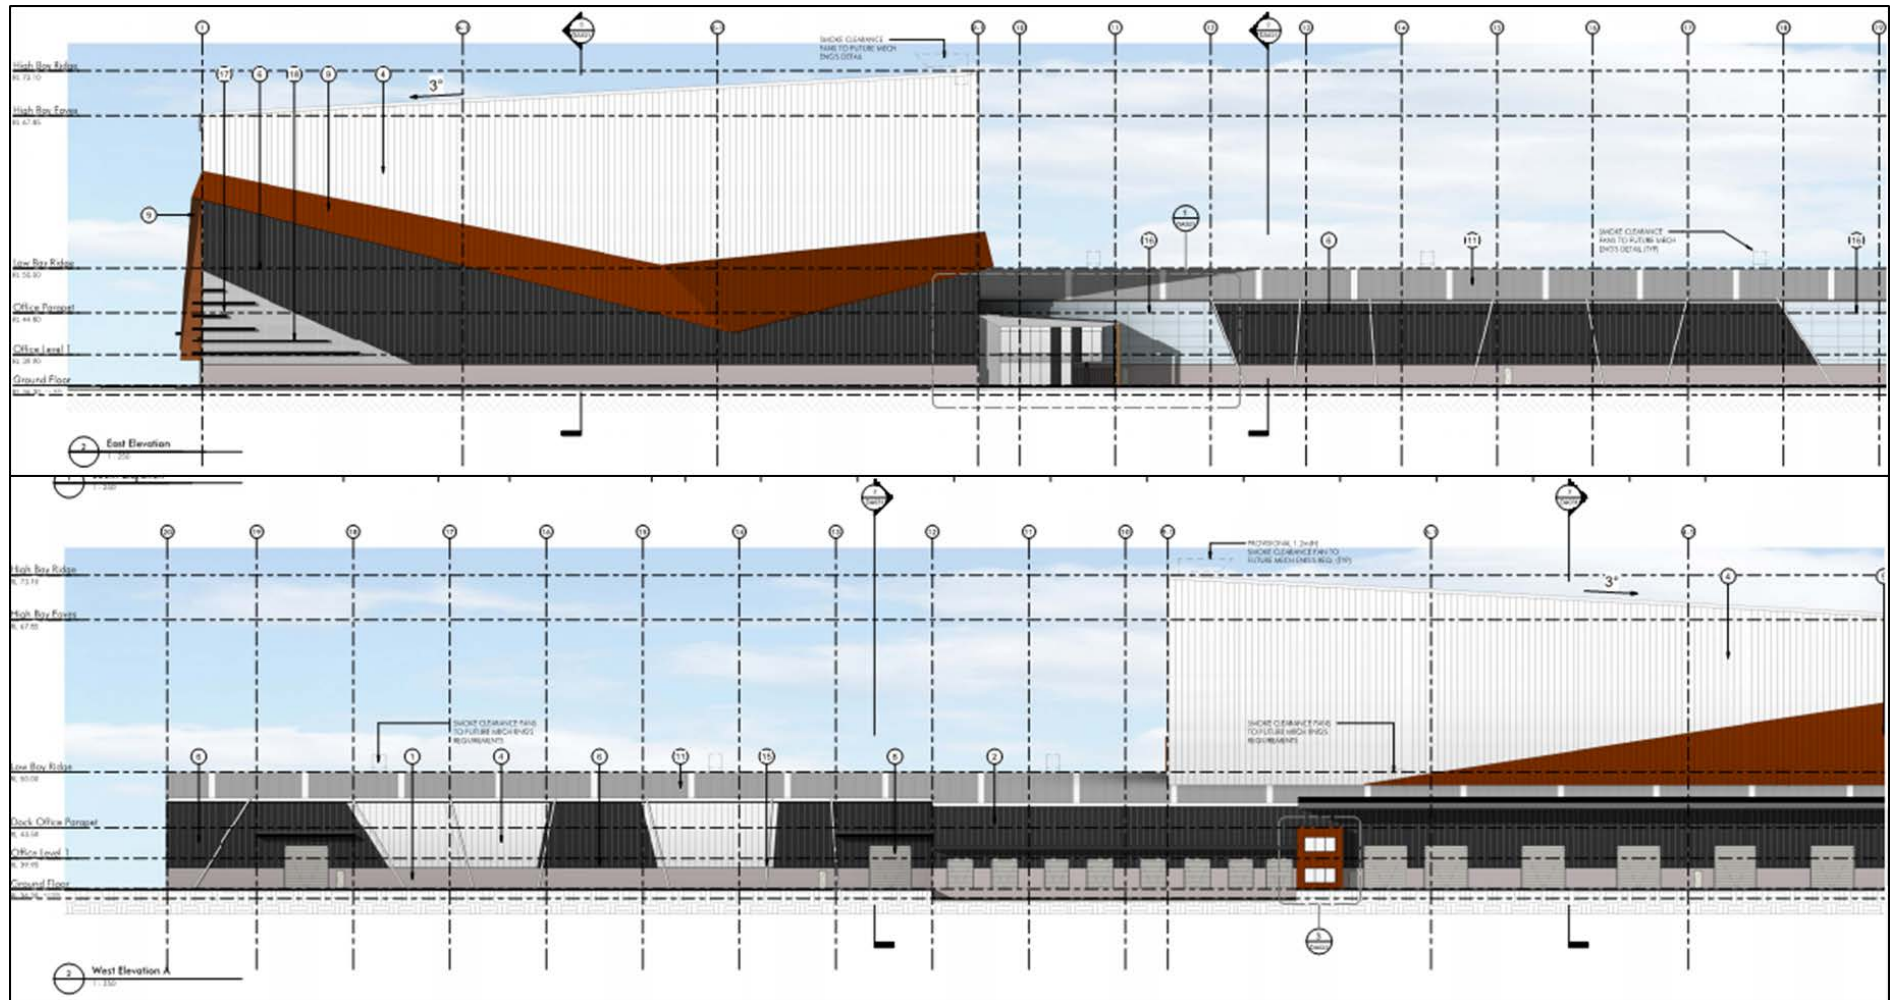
West Elevation (Bottom) & East Elevation (Top) of Subject Site (Nettleton Tribe, 2018)
